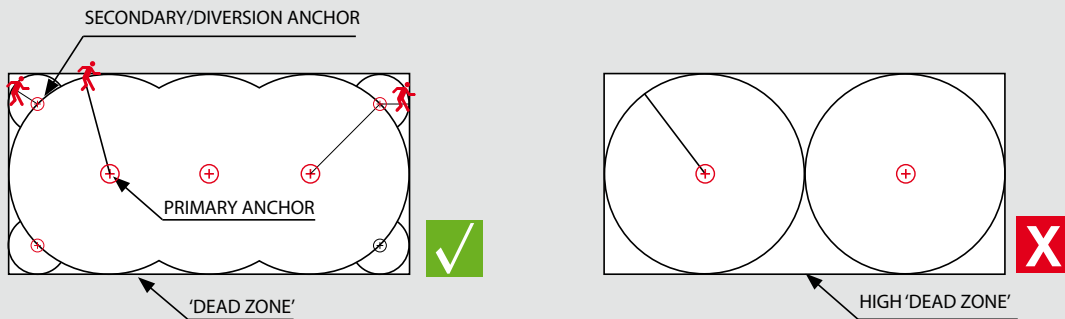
Incorrect anchor layouts create large dead zones / Correct anchor layouts reduce dead zones
